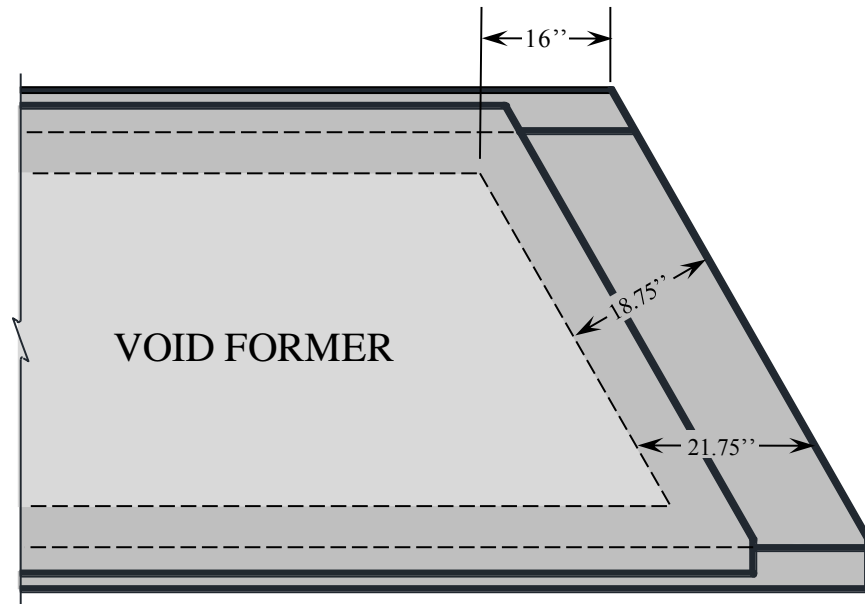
Plan View of Skewed End of 5B40 box beams with skewed internal void.
